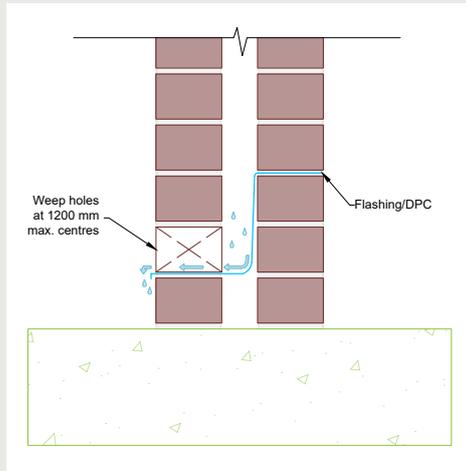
Moisture Path at Base Flashing of Cavity Brick Wall
